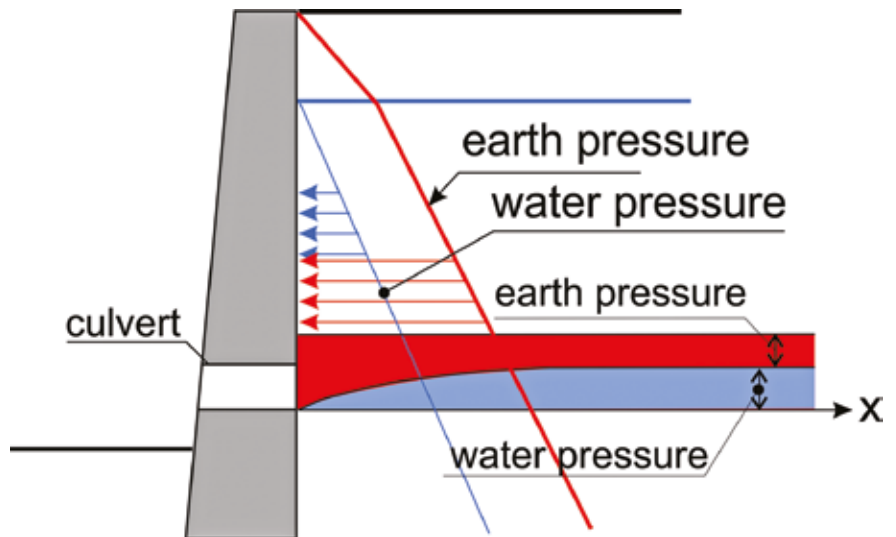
Earth pressure and water pressure acting upon a torrential barrier with a culvert.
